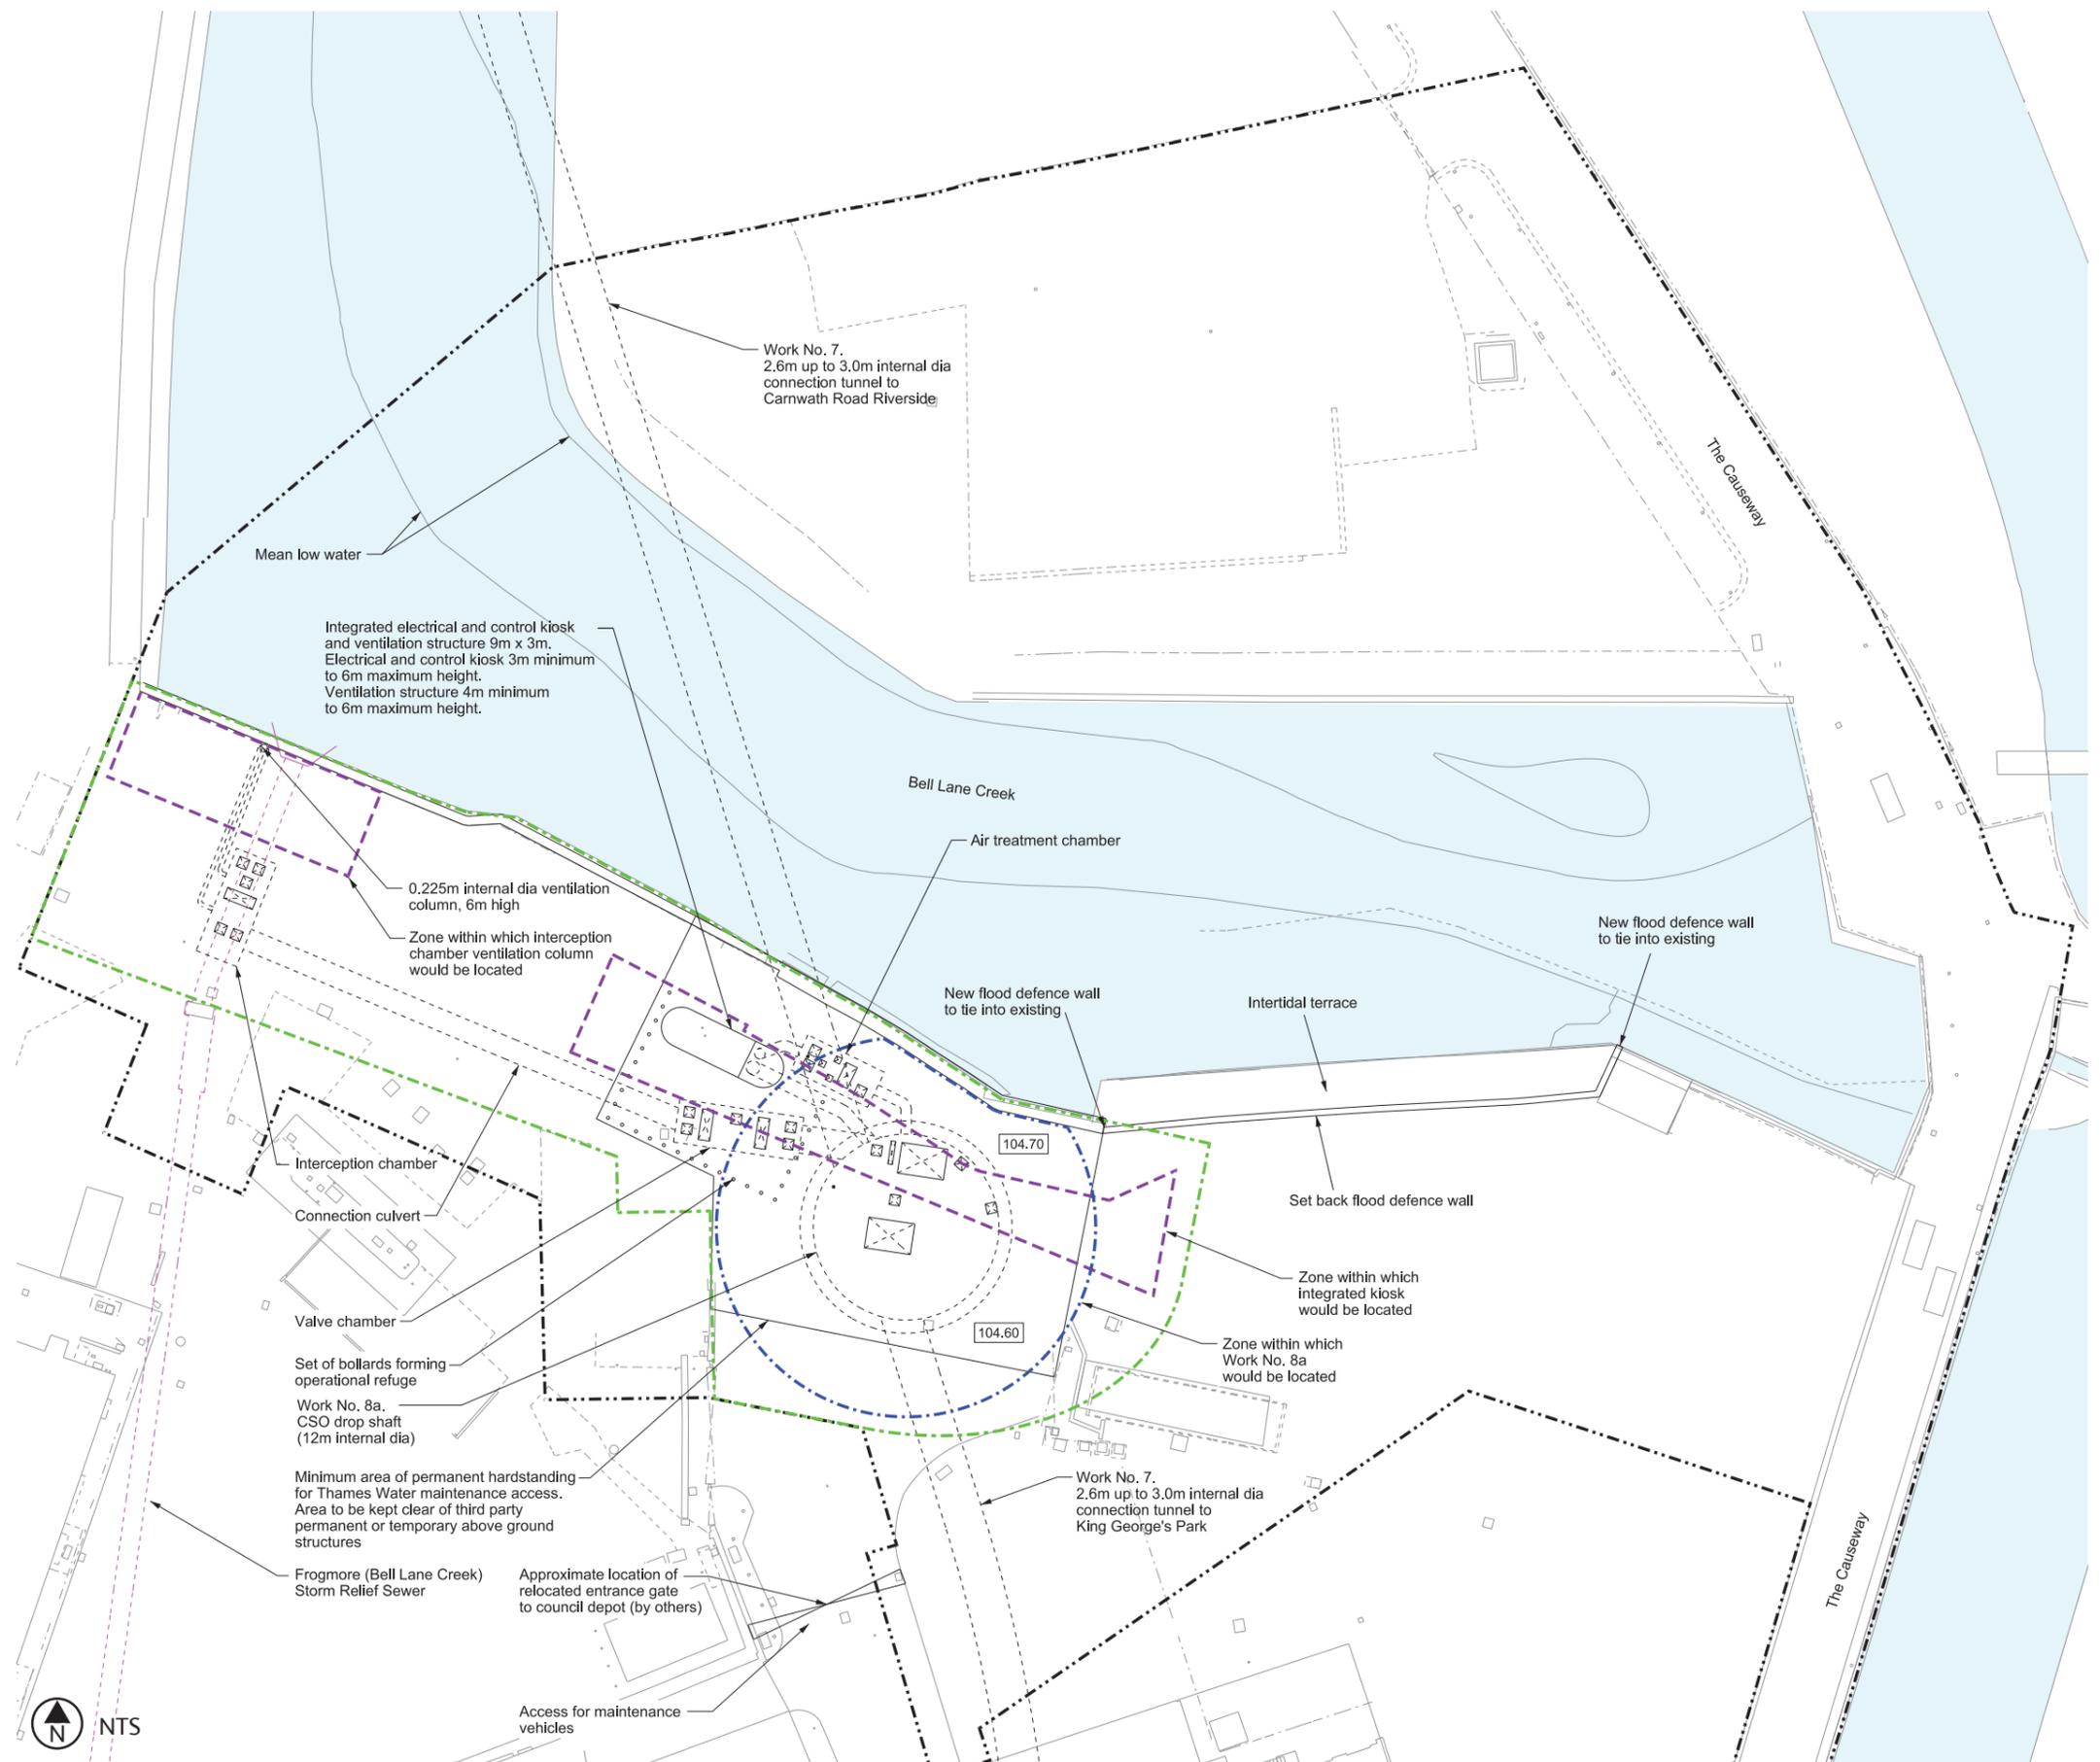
Permanent works layout - refer to Permanent works layout in the *Book of Plans
